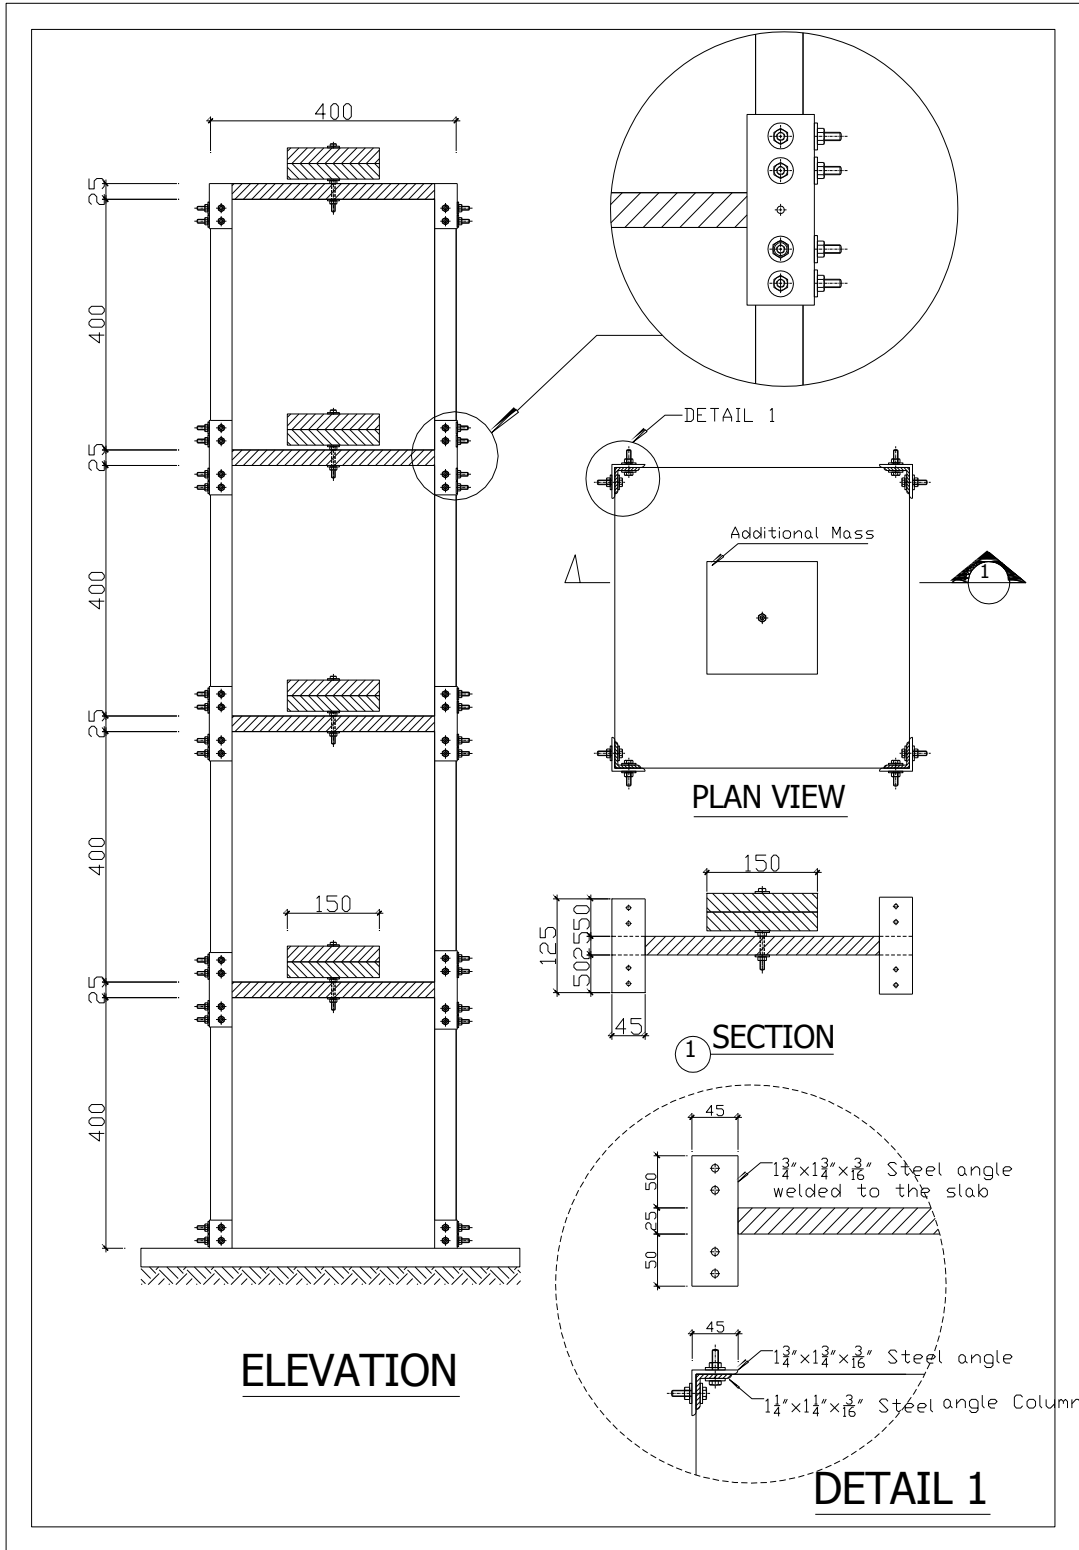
Elevation view and connection details of the structure (all dimensions in mm)
